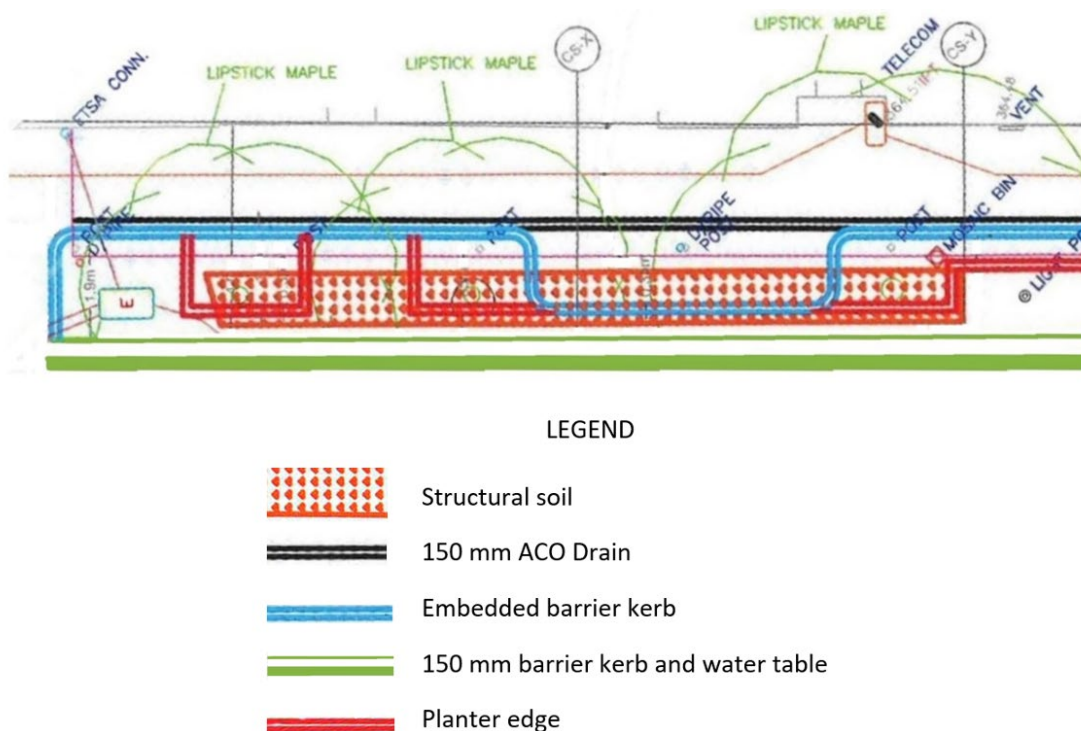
Tree trenches with structural soil increased root volume beneath tree pits and footpaths. The trench shown above is indicative; 16.6 m in length it contained 12.7 cubic metres of structural soil.
